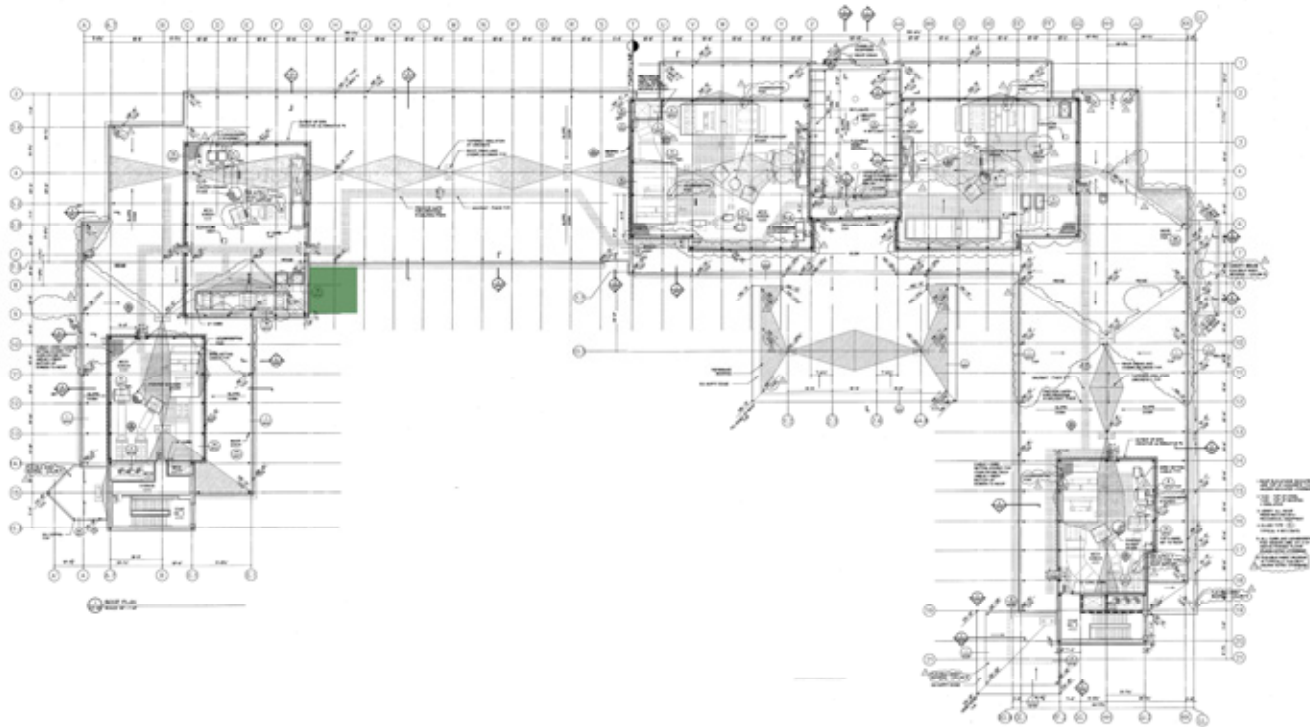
The green area indicates the ideal place to put stairs for public access on to the PES Building rooftop.
